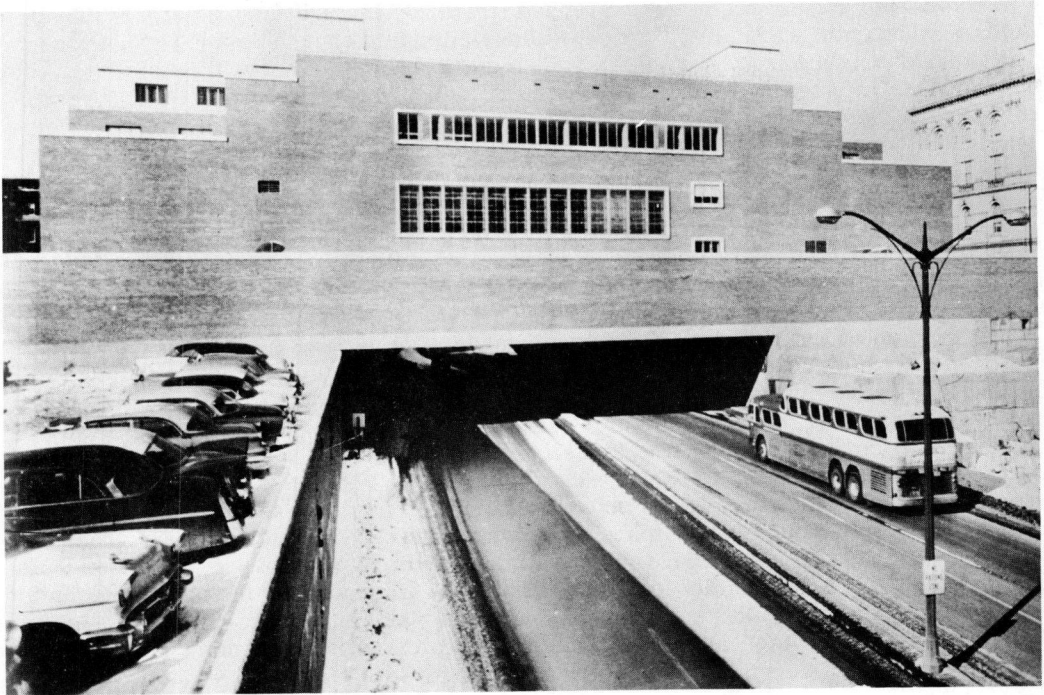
Building spanning highway is a public library in Hartford, Conn. Windowless section at base of building houses girders supporting structure in addition to containing library's basement stack areas.
